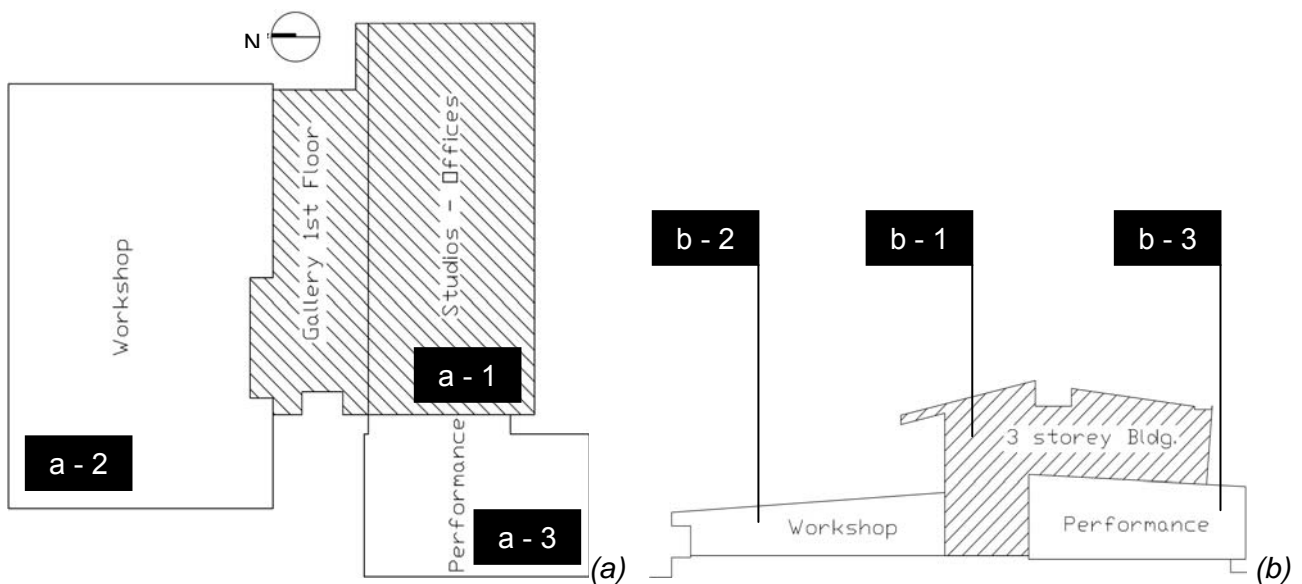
Layout of Arts and Media complex – Plan section in (a) and west elevation in (b)
